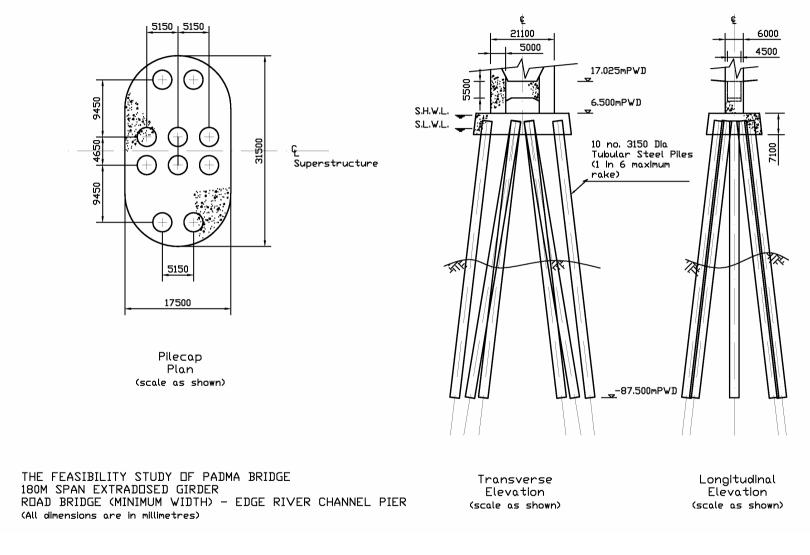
Edge River Substructure General Arrangement (Alternative-H3)
